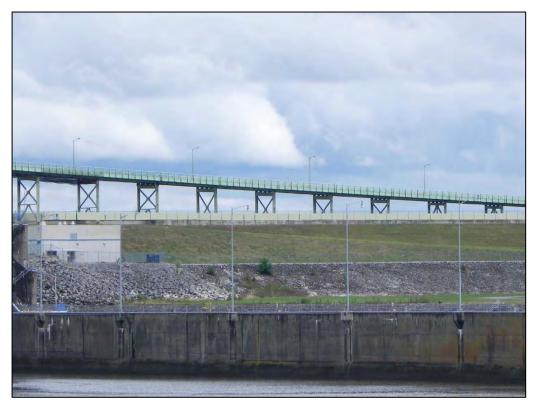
Rendering of a 5.8-foot Floodwall at Fort Loudoun Dam Segment FTL-2
